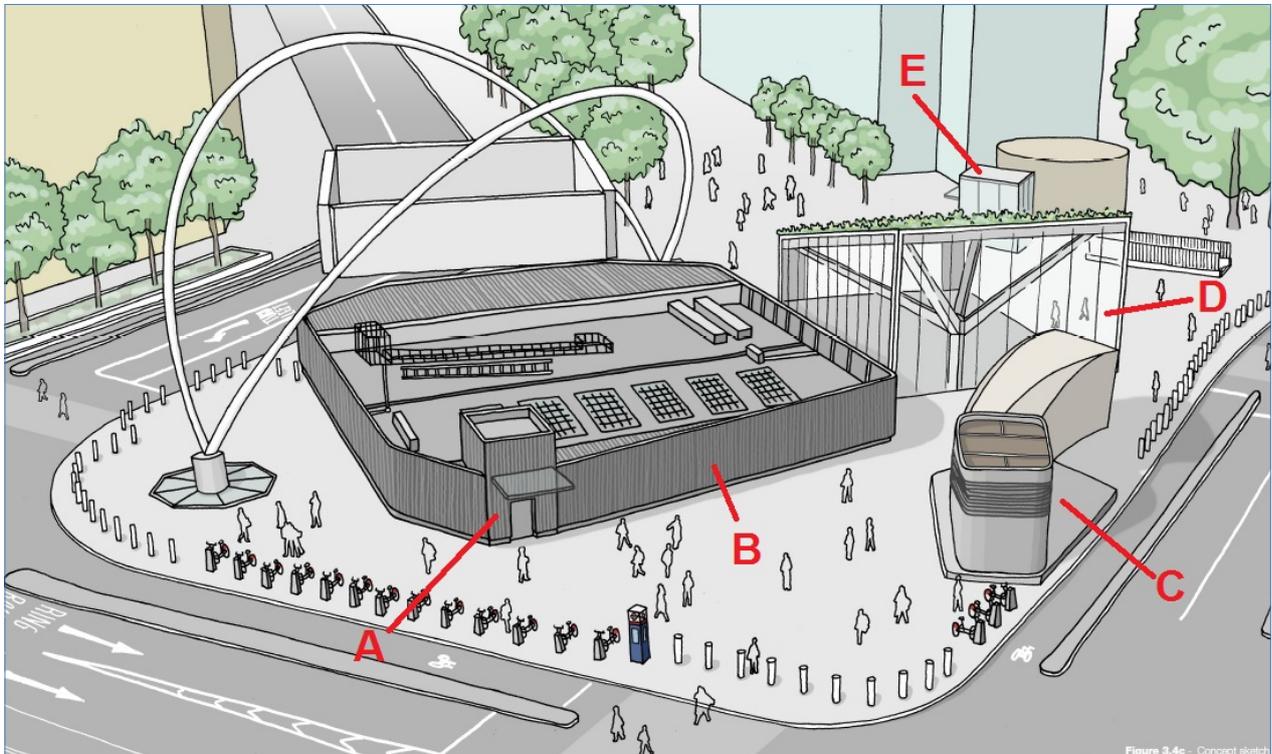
Proposed dedicated servicing/ goods lift (A), new cladding to existing clerestory roof (B), retained ventilation shafts (C), new station entrance (D), and new public lift (E).
